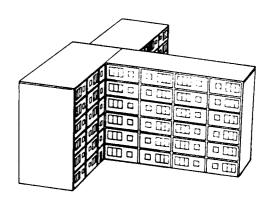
Mass Construction ---Box-Wall Type, Multiple Module Variation.
